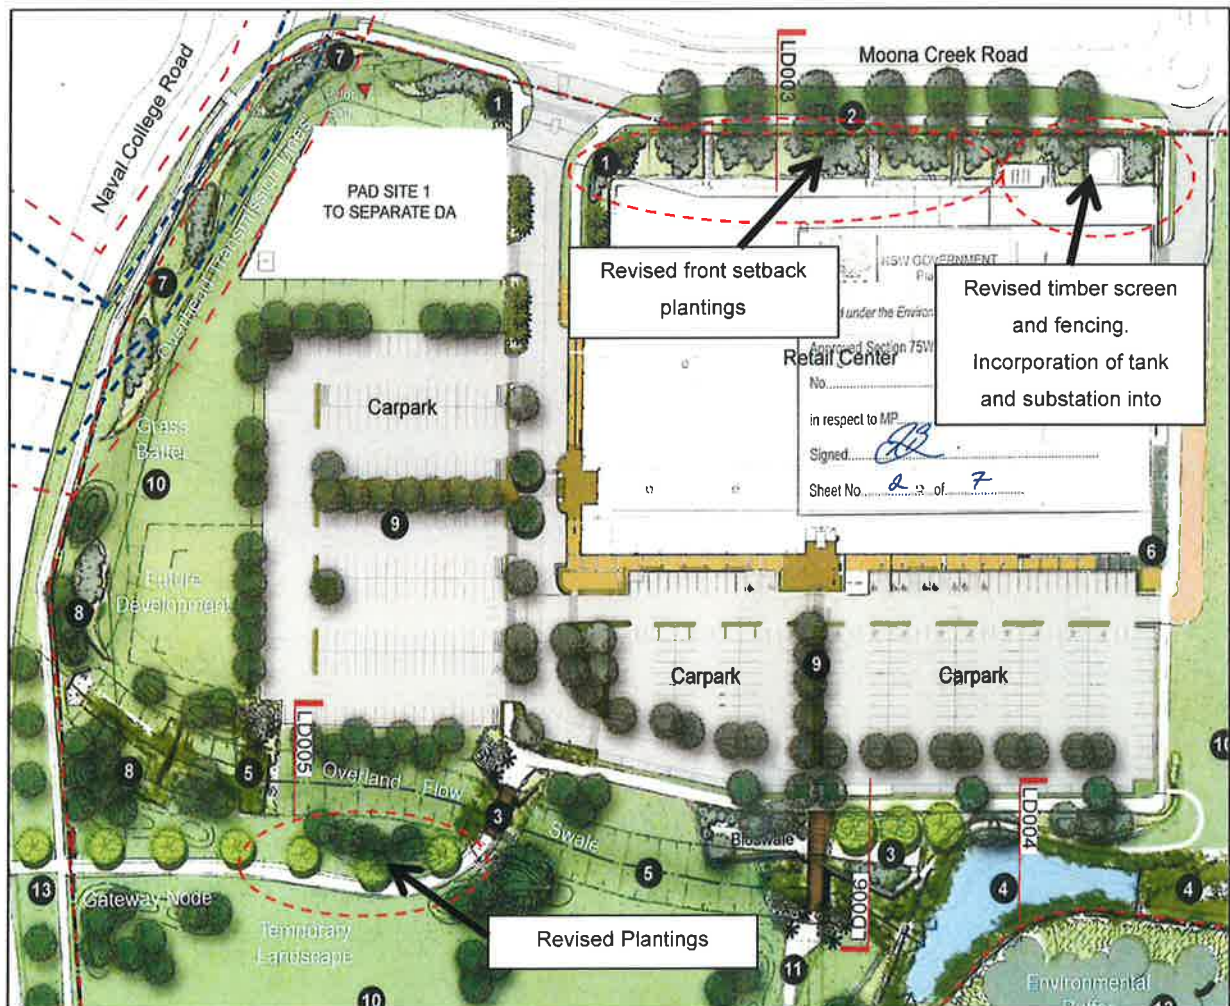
| Approved landscape plan with areas affected by the proposed modification circled in red (base image source: approved plans Modification 6)
